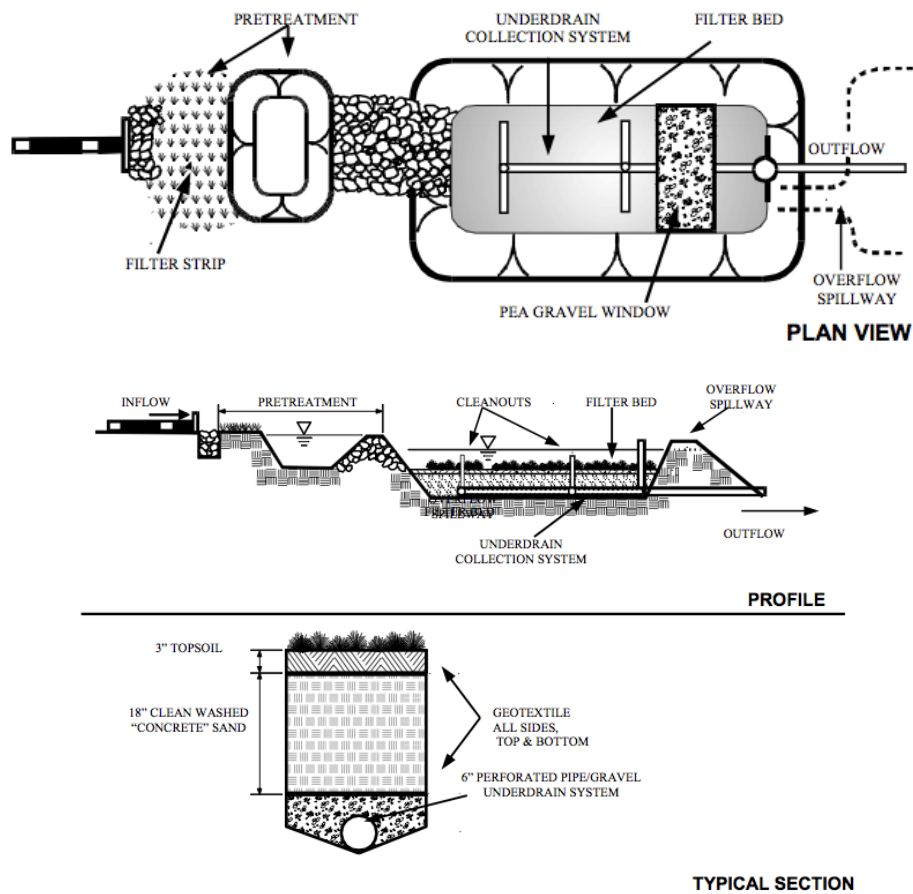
Pocket Sand Filter Plan and Section View (MDE, 2009)
